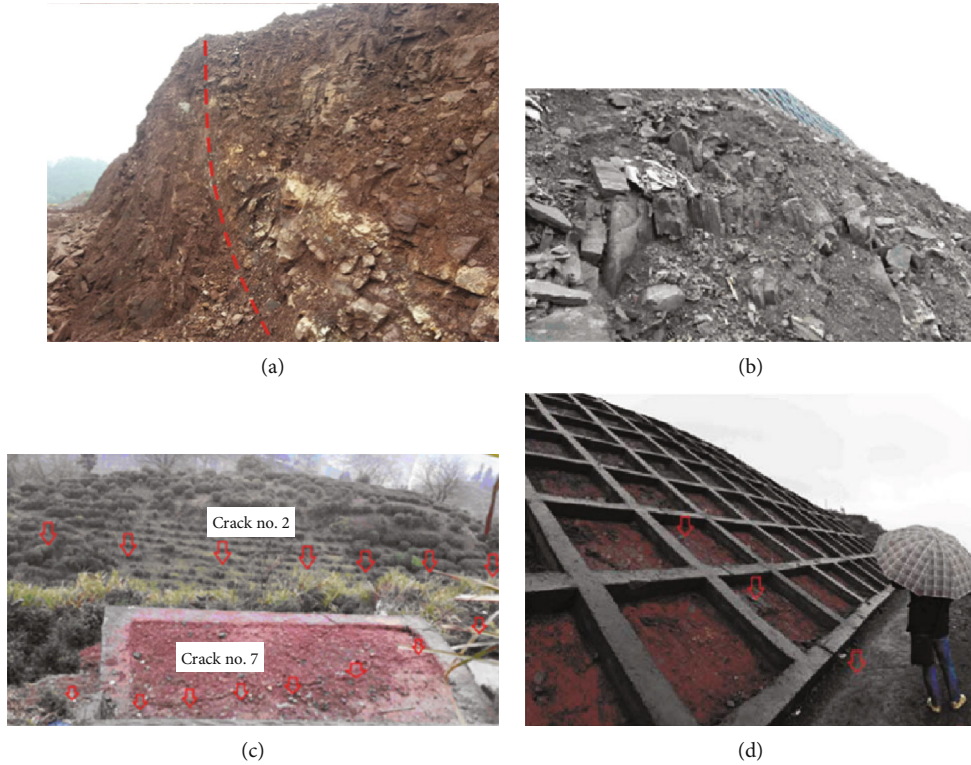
Deformation and cracks: (a) excavation reveals of the faults, (b) slope foot uplift, (c) main deformation crack, and (d) main deformation cracks of grid beam.
